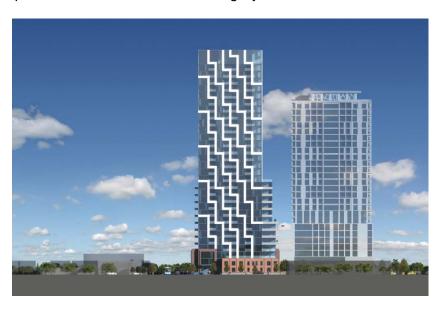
East Elevation of the proposed development showing the reconstructed façade of Radigan Building, G+C Architects, June 2023.
